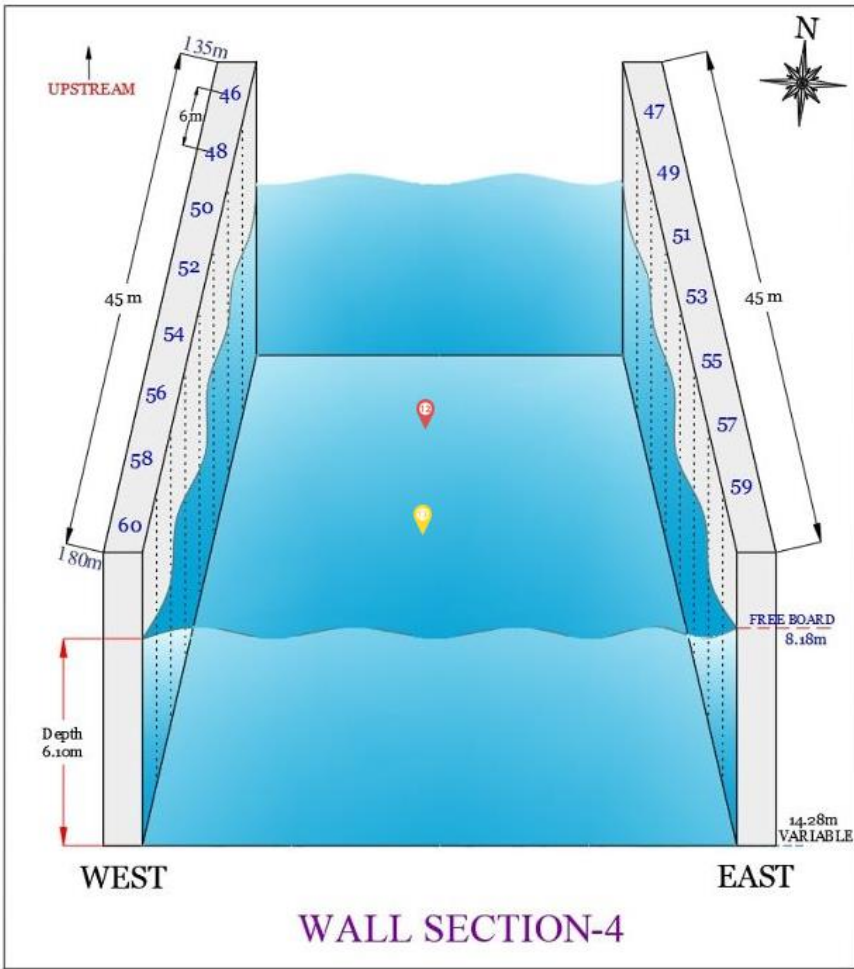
Heat map and Observations at Wall Bottom Section 46 - 60
